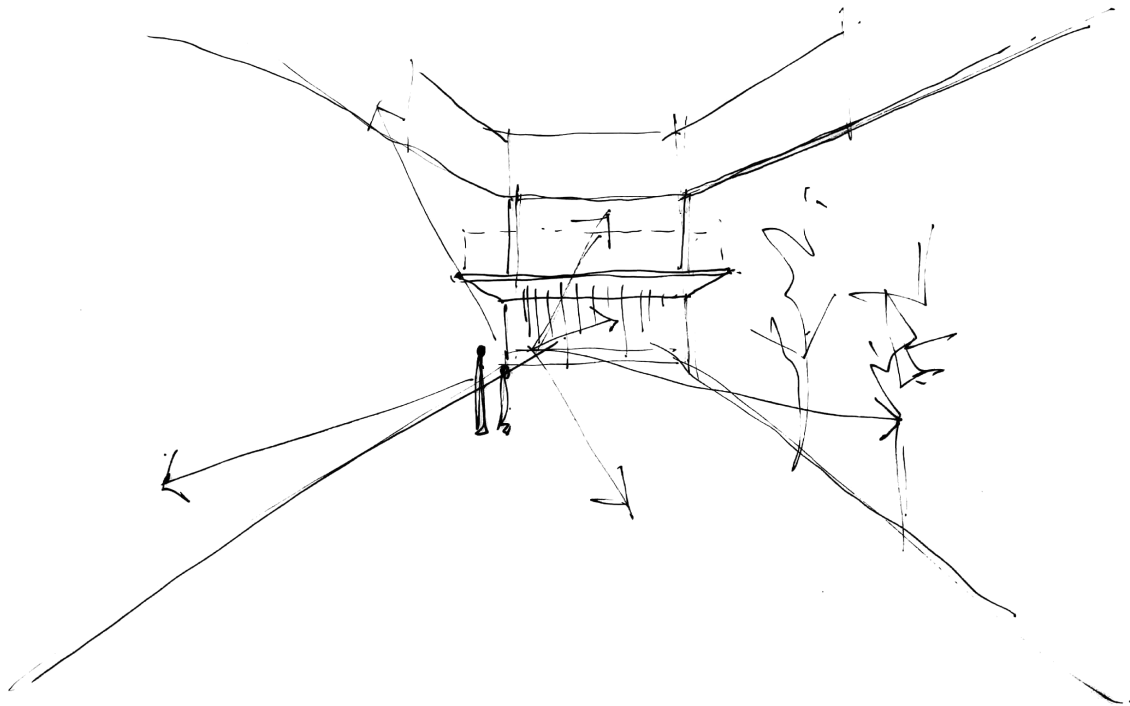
Sketches of how light can be used to gather and shape the feeling of the building, by Author. 2019
